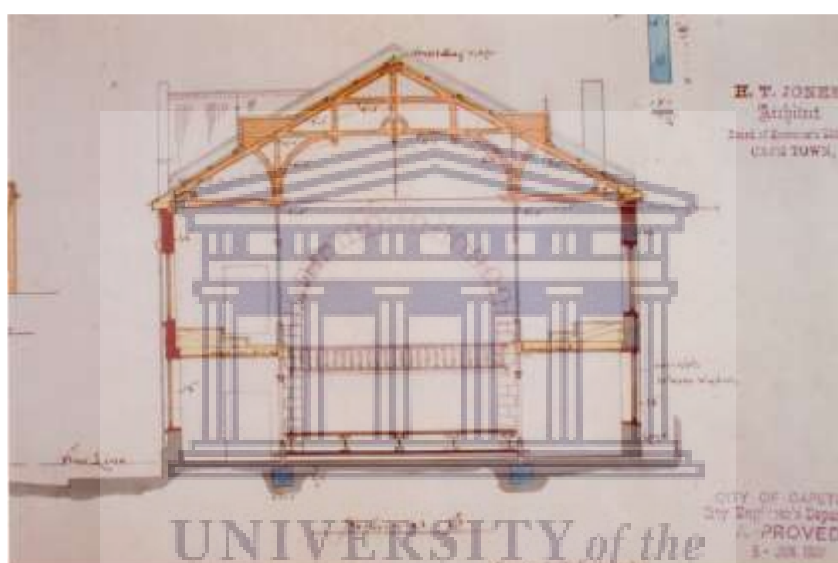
H. T. Jones 1902 architectural cross-section drawing indicating the raised walls, new roof height, reconfigured arch and new roof profile. Source: Rennie, Scurr & Adendorff Architects.
